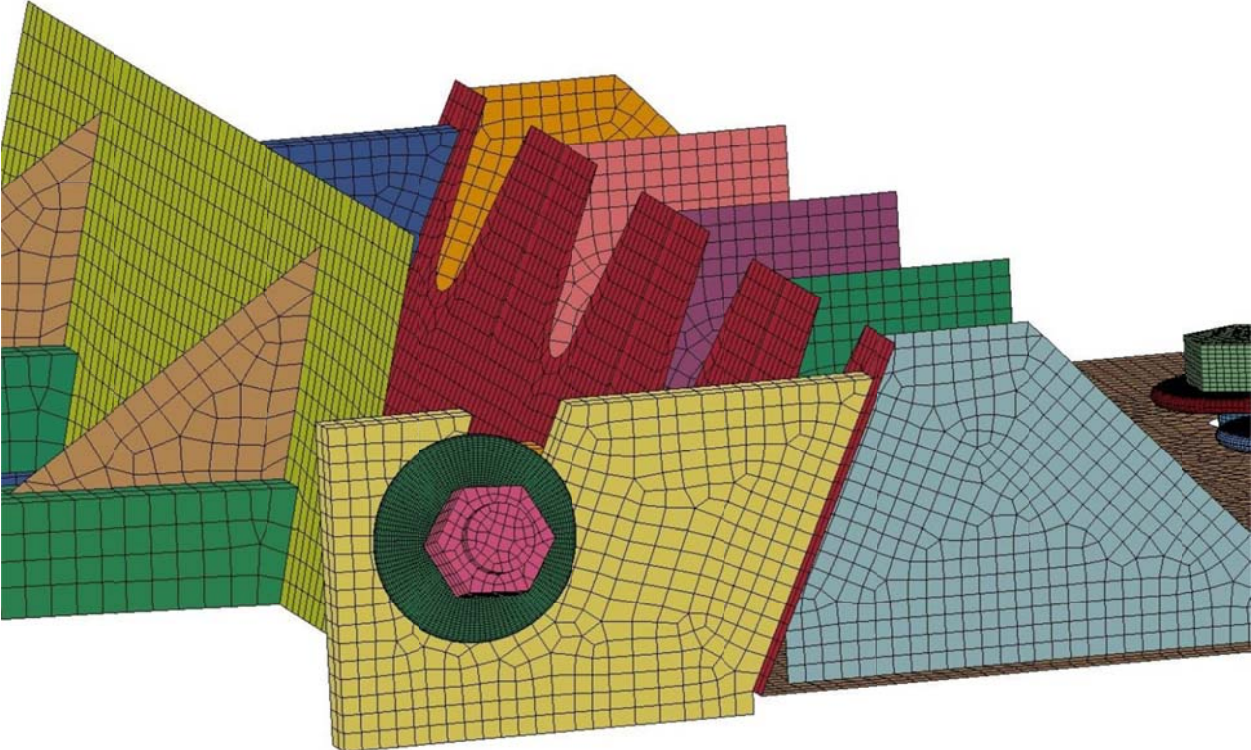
Cable Anchor Components After Cable Release, Final Redesign
